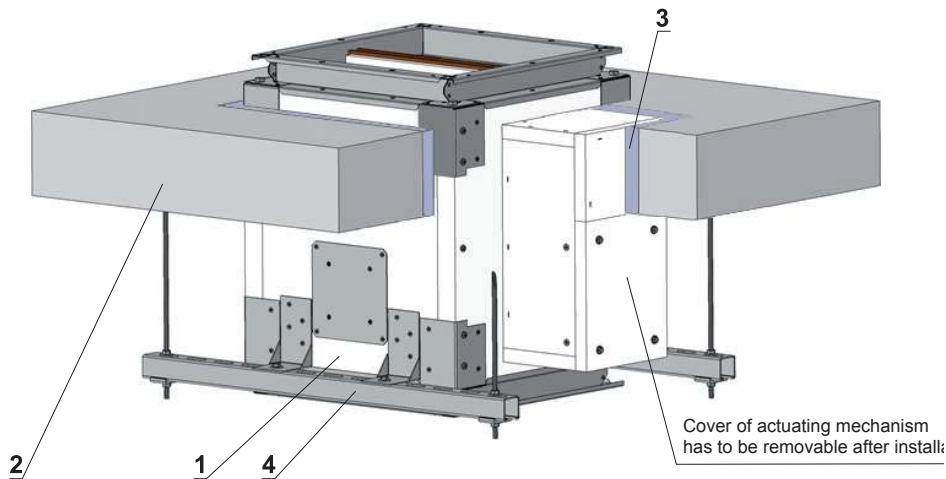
Example of installation in solid ceiling construction of fire compartment - actuating mechanism above
